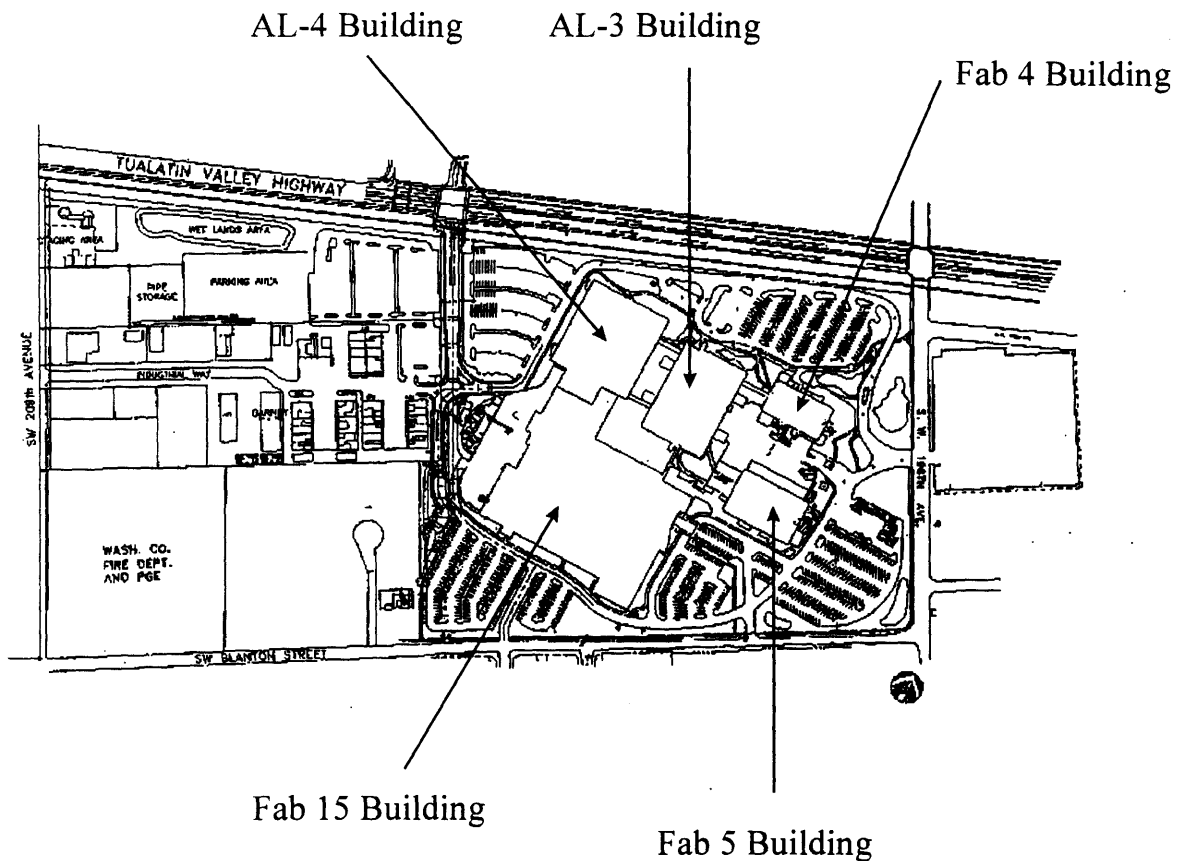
Plan View, Intel Aloha Site Campus, June 1996
